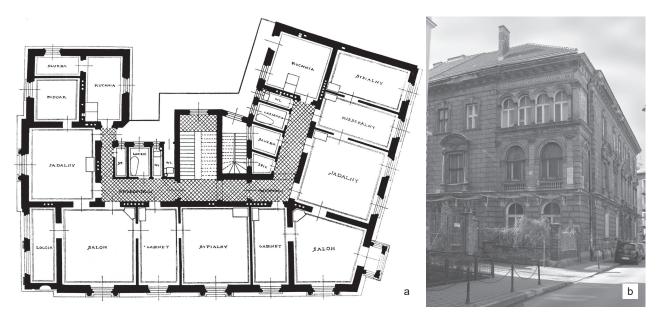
Townhouse at 14 Studencka Street/ 12 Garncarska Street (designed by W. Ekielski, 1892–1893): a) first floor plan (source: Ekielski 1904, 155, 156), b) façade (photo by B. Makowska)
